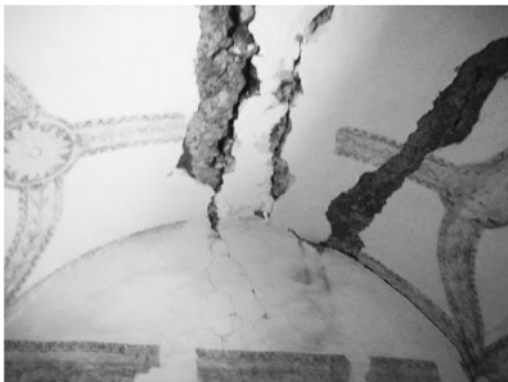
Sacristy, lower cloister from the intrados exposing longitudinal cracks, photo taken in 2017.
